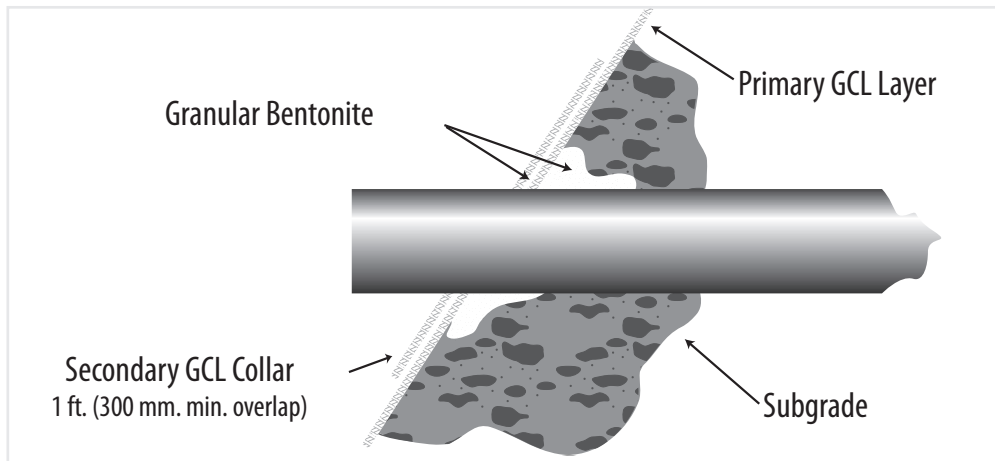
B ISOMETRIC VIEW OF A COMPLETED HORIZONTAL PIPE PENETRATION
